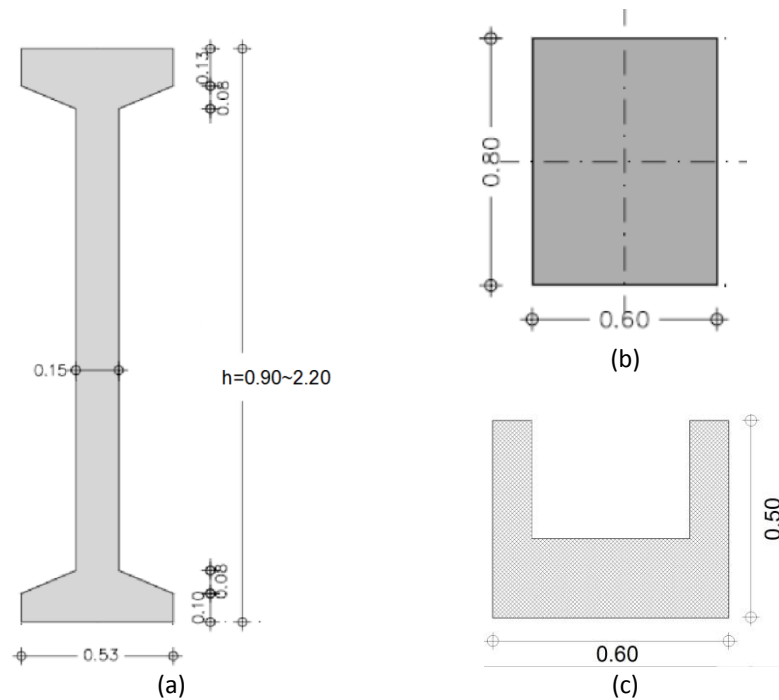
Elements' cross sections: (a) Main girder; (b) Column; (c) Secondary beam (original structure).
